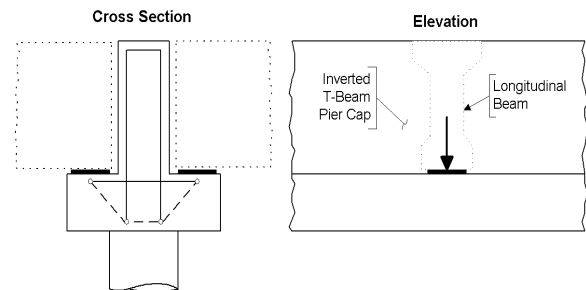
Inverted T-Beam Pier Cap.
